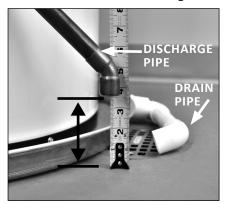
The end of the T&P Relief Valve discharge pipe must stop no more than six inches above a floor drain or terminate outside the building.
